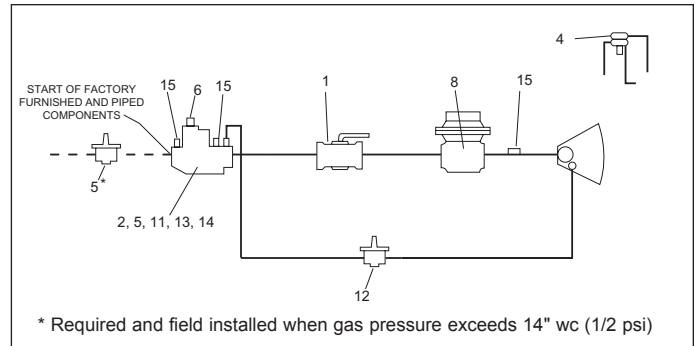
Typical Manifold Component Arrangements Standard, IRI, & FM Arrangement - Over 400,000 Btu/h and up to 720,000 Btu/Hr
